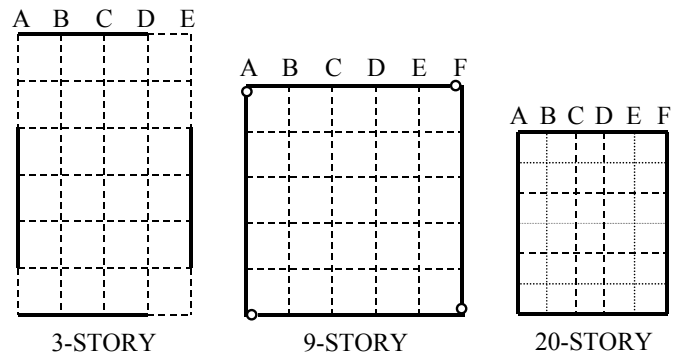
Floor Plans Showing Layout of Moment Resisting Frames for LA Model Buildings
